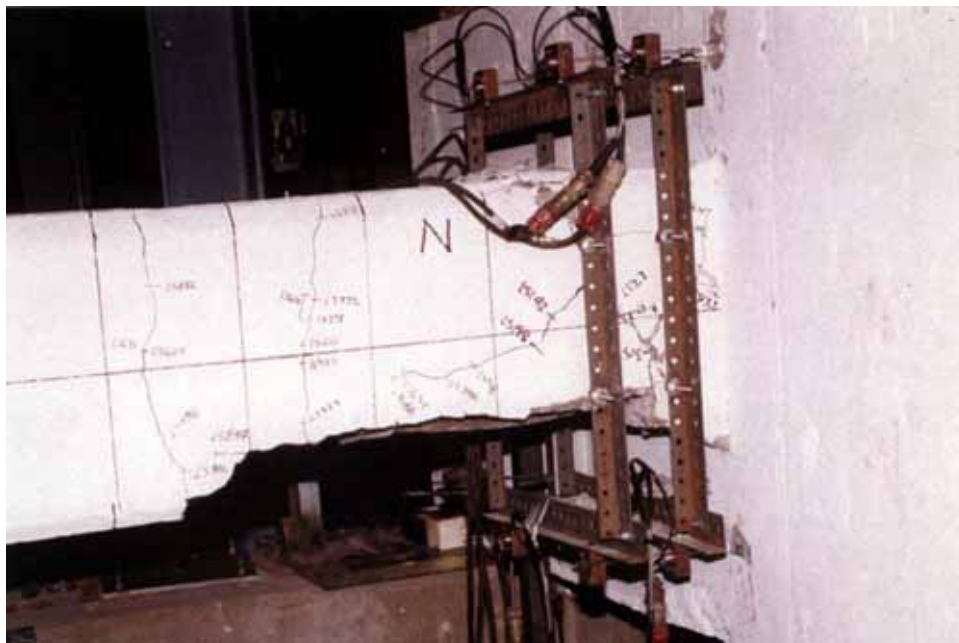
Damage to prestressed concrete pile at the conclusion of testing.
